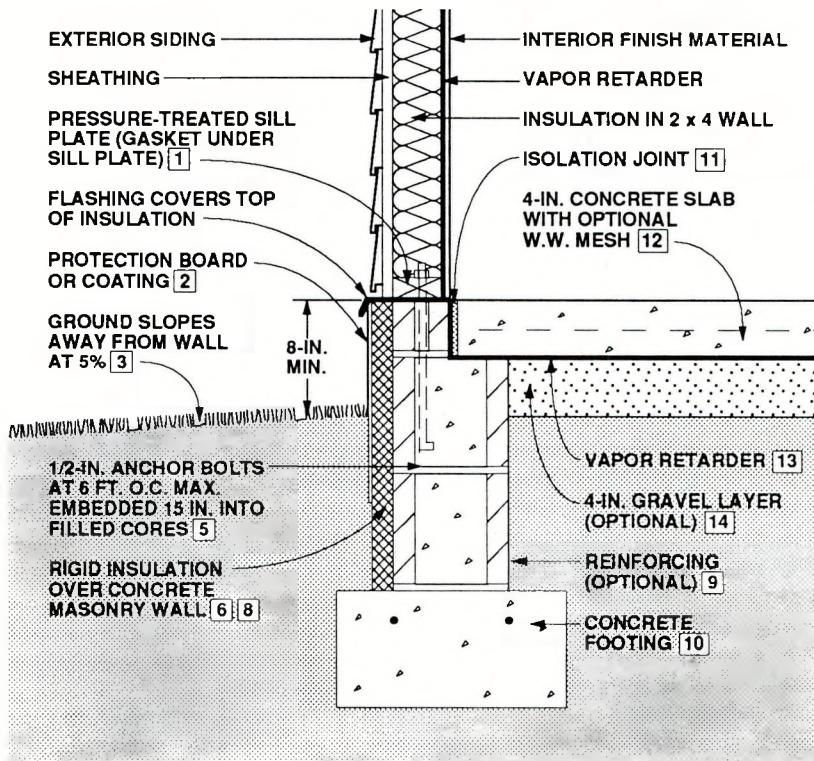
Slab-on-Grade with Masonry Wall (Exterior Insulation)
